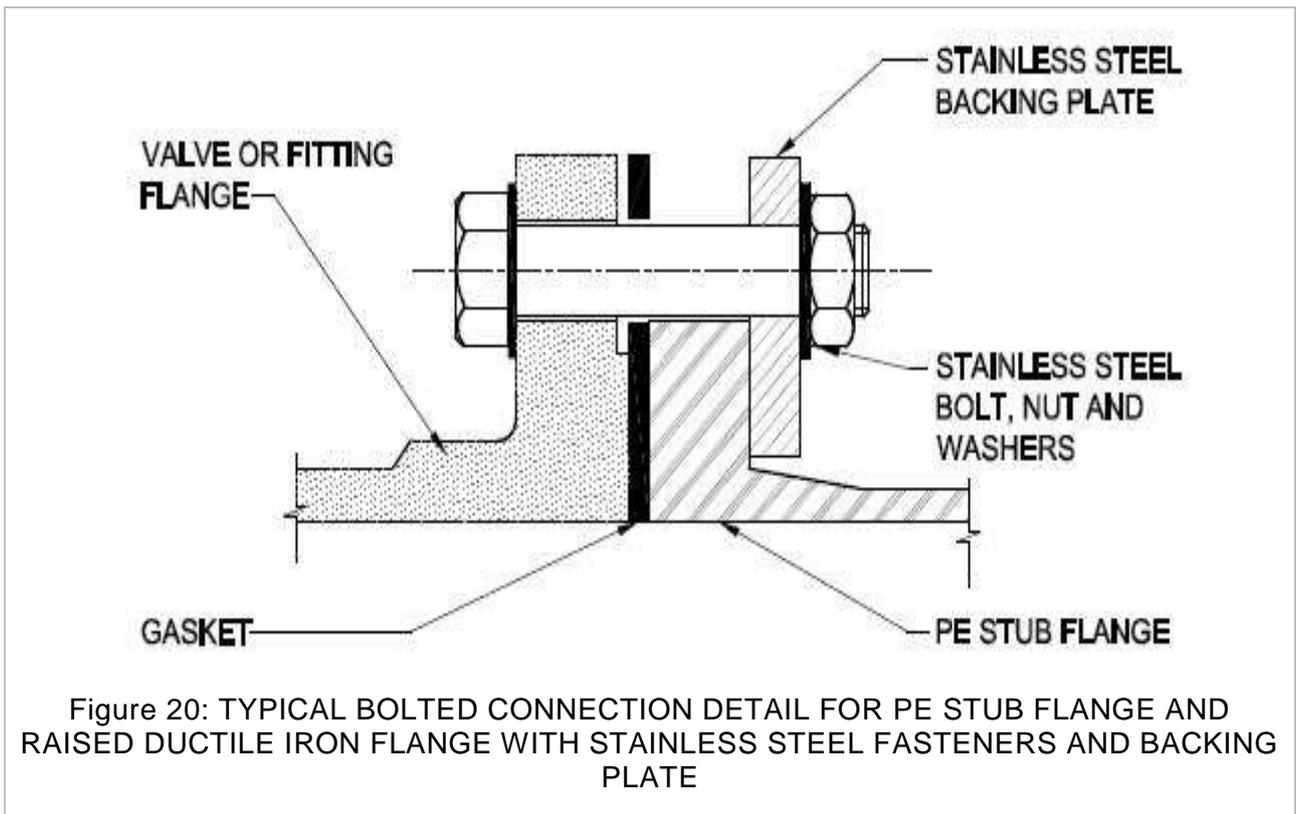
TYPICAL BOLTED CONNECTION DETAIL FOR PE STUB FLANGE AND RAISED DUCTILE IRON FLANGE WITH STAINLESS STEEL FASTENERS AND BACKING PLATE
